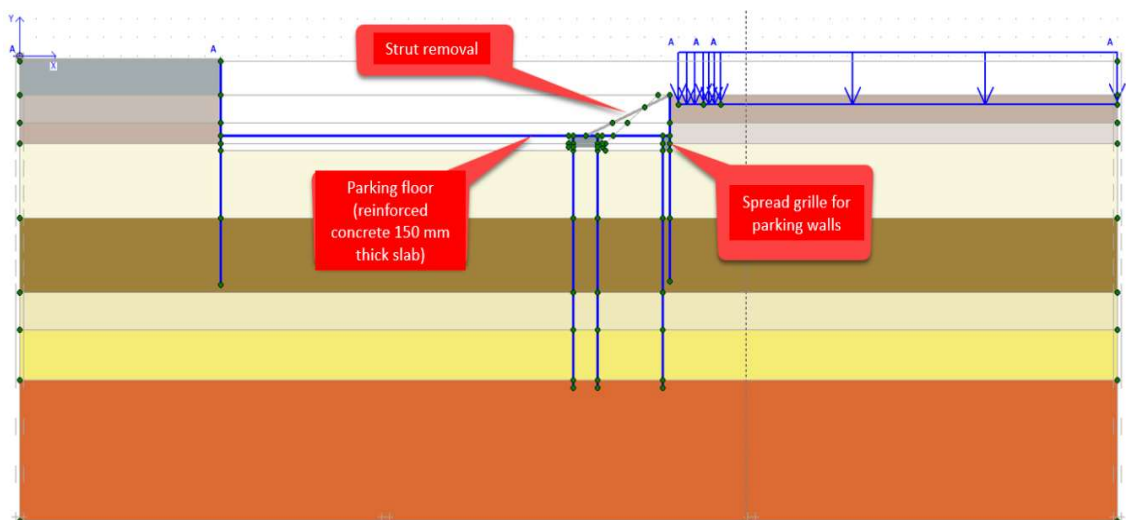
Stage 5 of the excavation shoring erection in section 1-1
